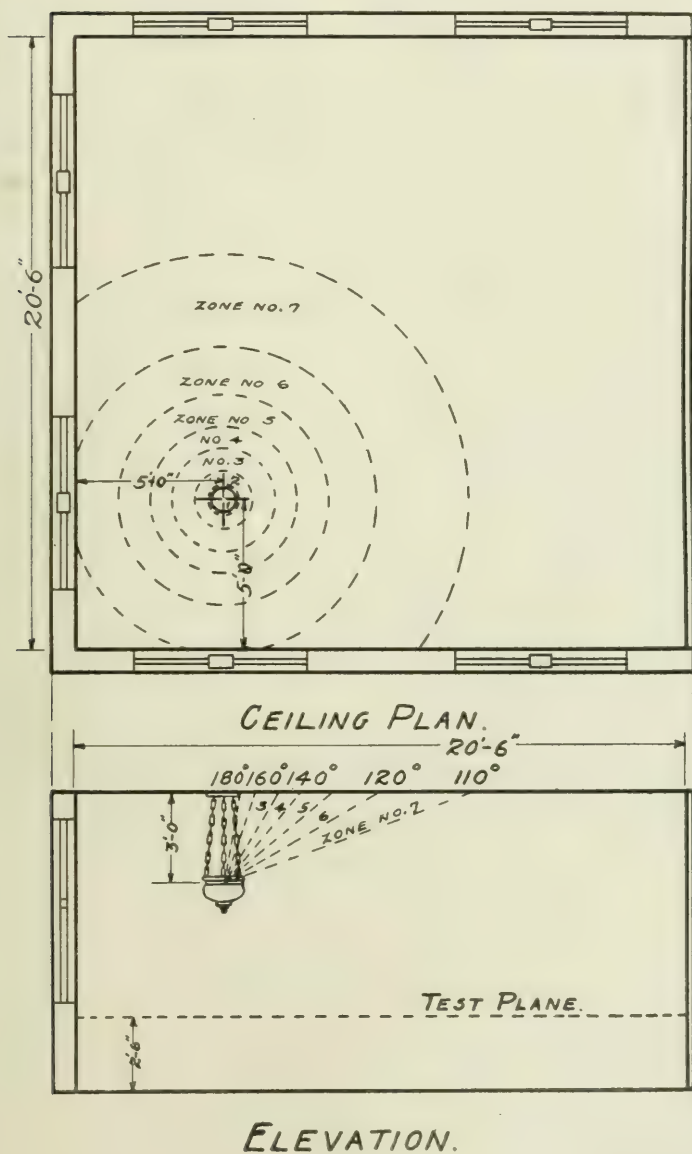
Test room showing positions of ceiling zones and light unit.
